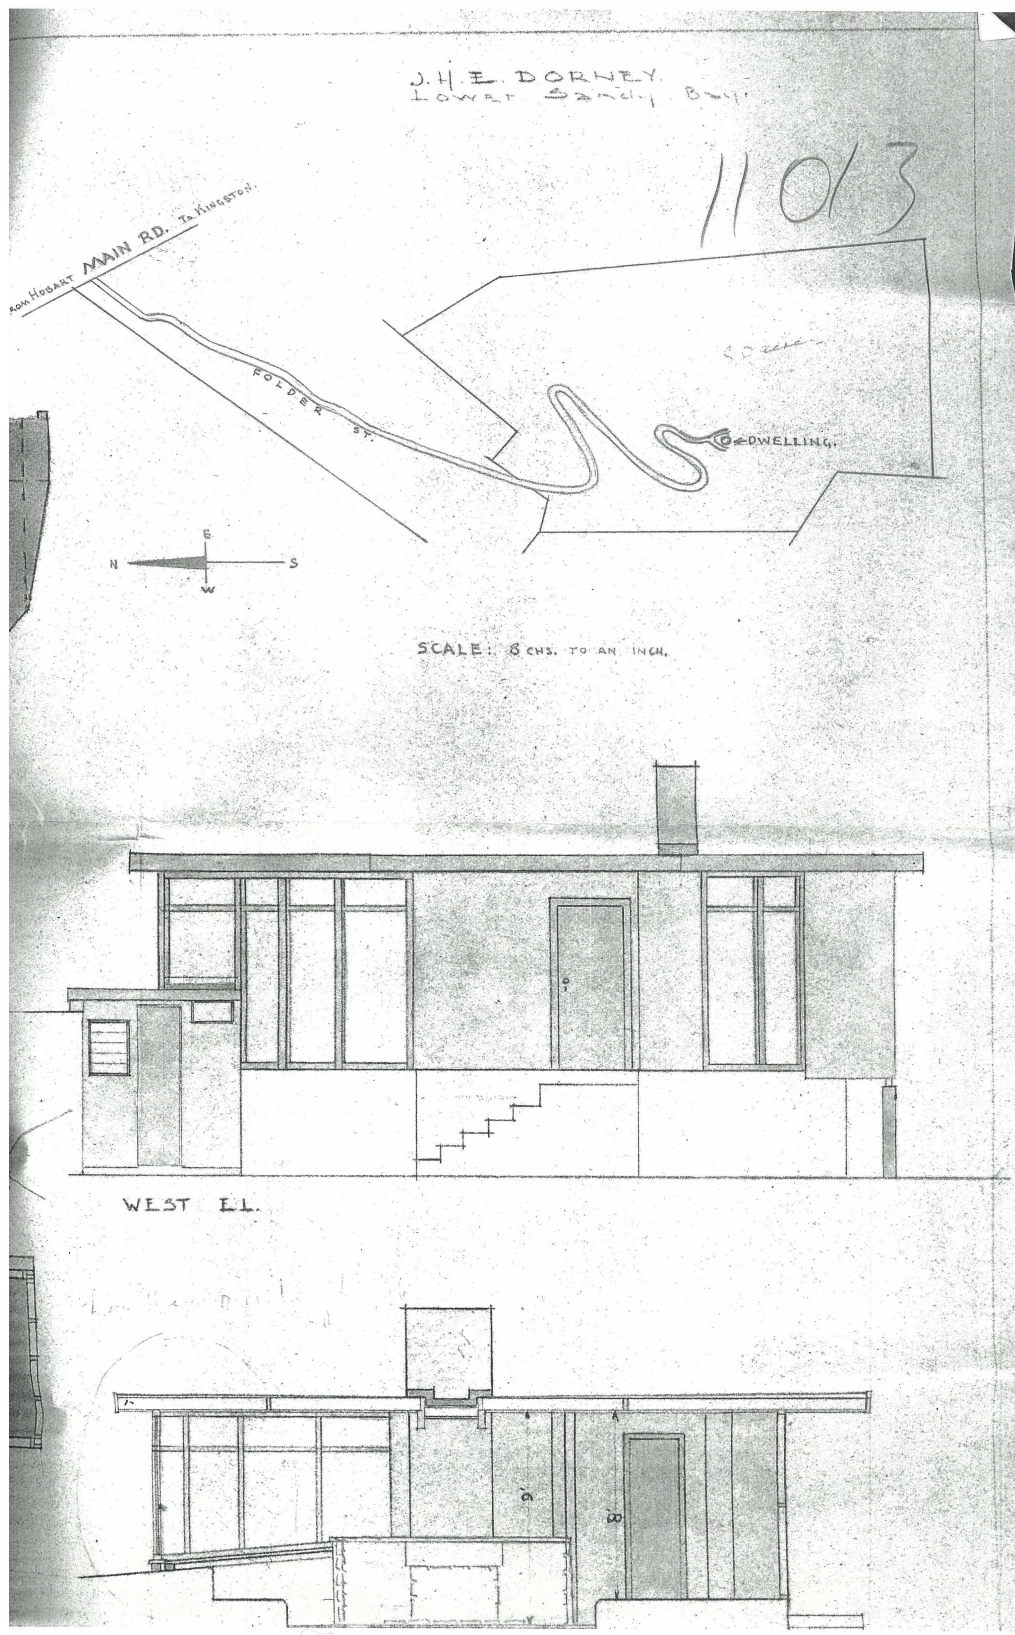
(1949) Site plan and elevations of 1949 circular house, JHE Dorney (HCC)
